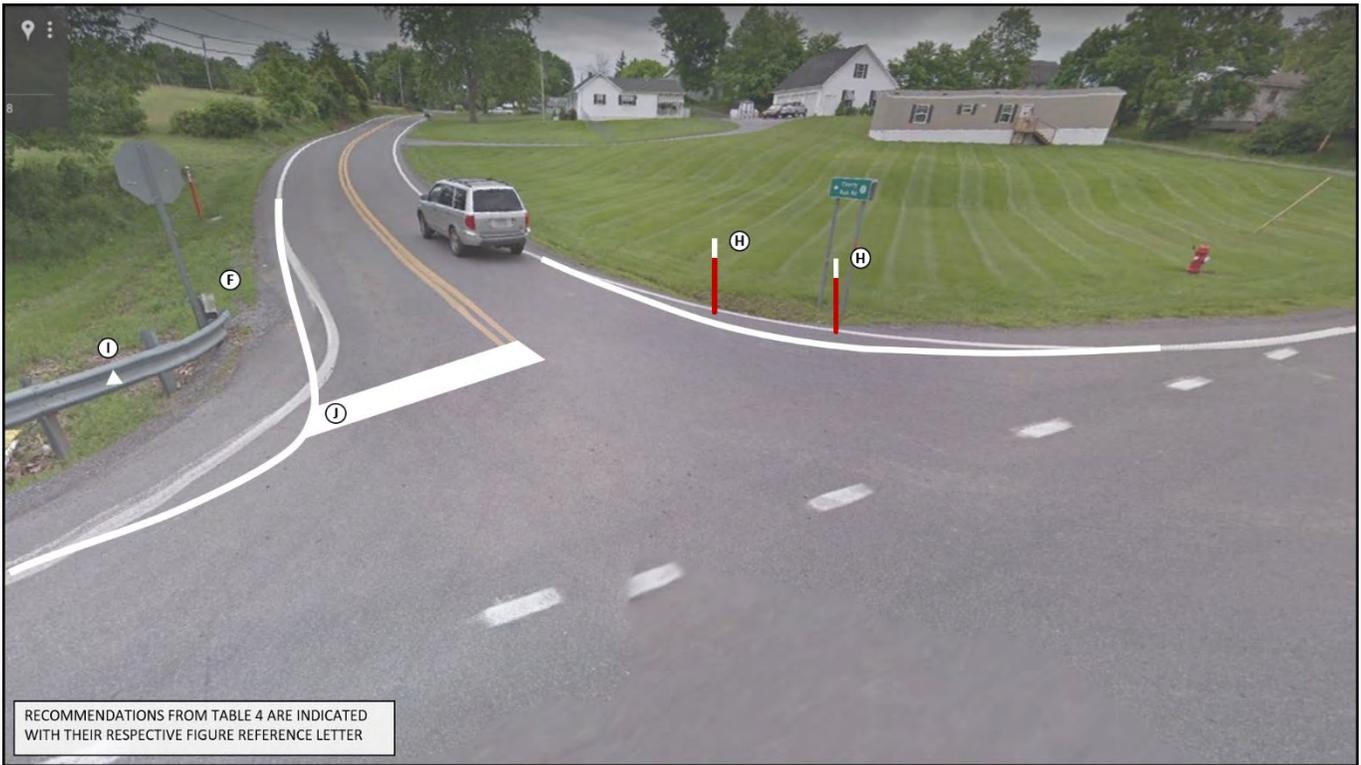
Signing and Pavement Marking Recommendations for Eastbound WV-9
